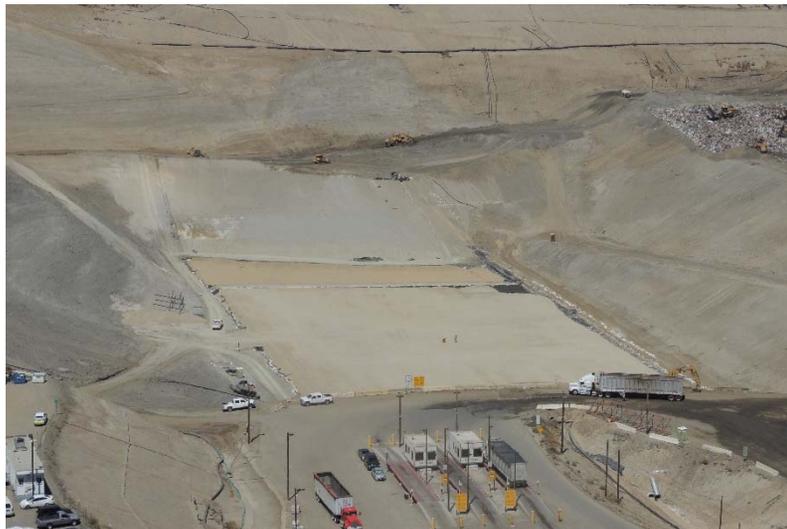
CC4A Part 2 Excavation Area: September 12, 2017
